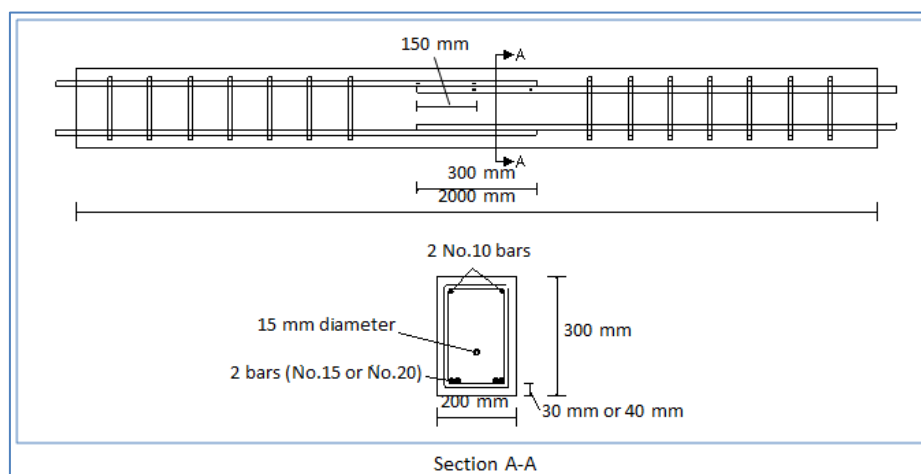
Specimen geometry and reinforcement details. (1 mm = 0.03937 in)
